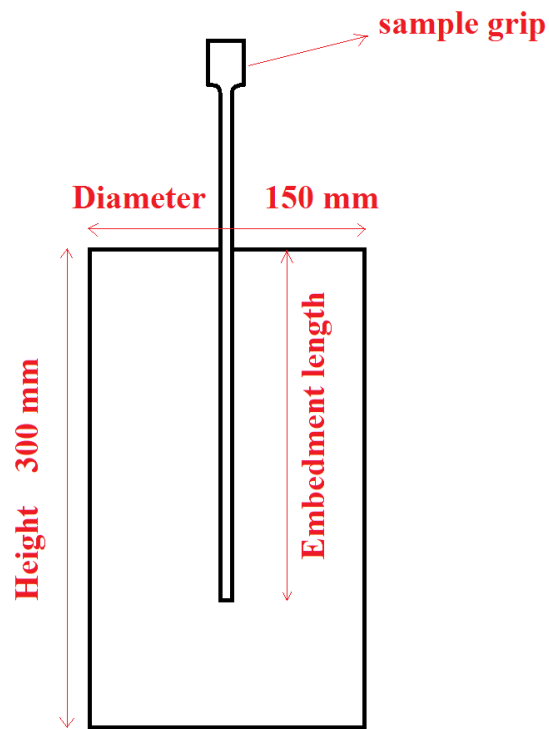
Details of the pull-out concrete sample with embedment BVC bar
